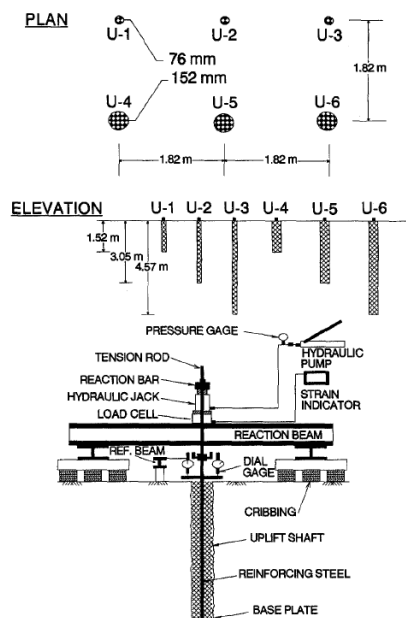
Shaft layout and test setup (Lutenege et al. 1994)
